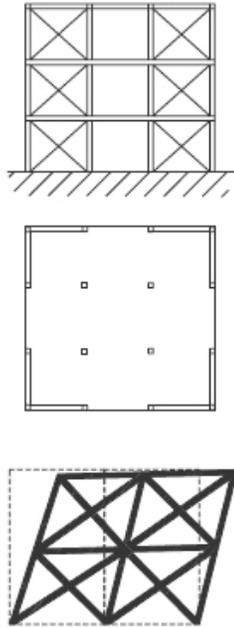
Elevation, plan, and deformed shape of cross braced frame (Szakats 2006)
